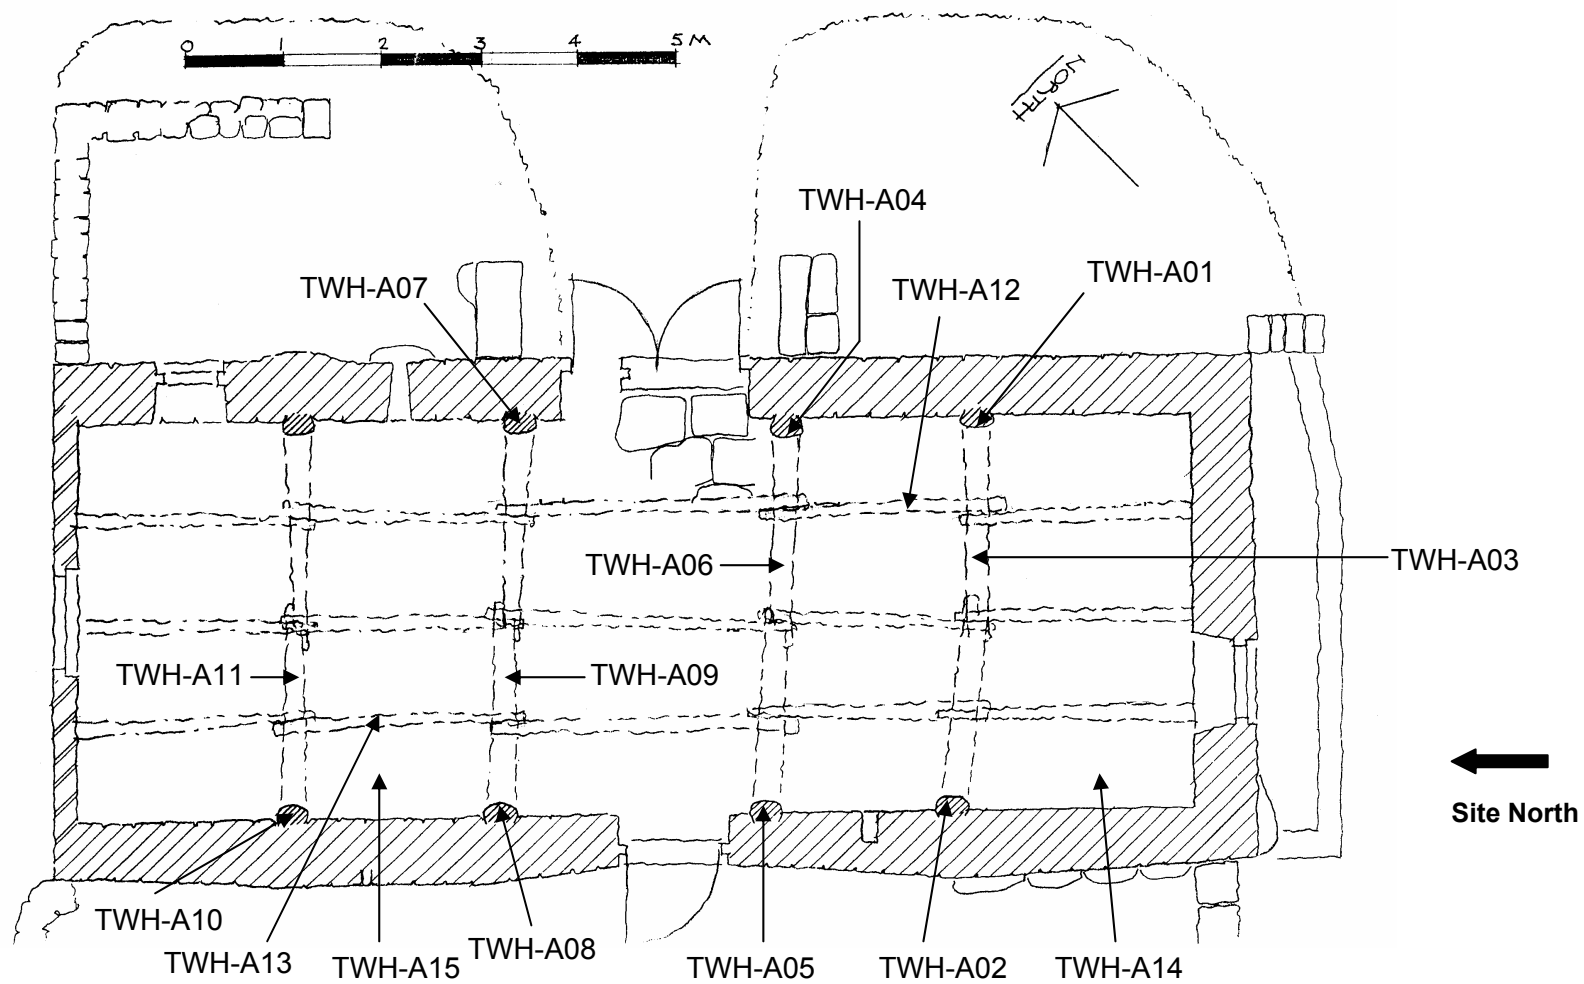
Ground plan (Kevin Doonan), showing the location of samples TWH-A01–15
